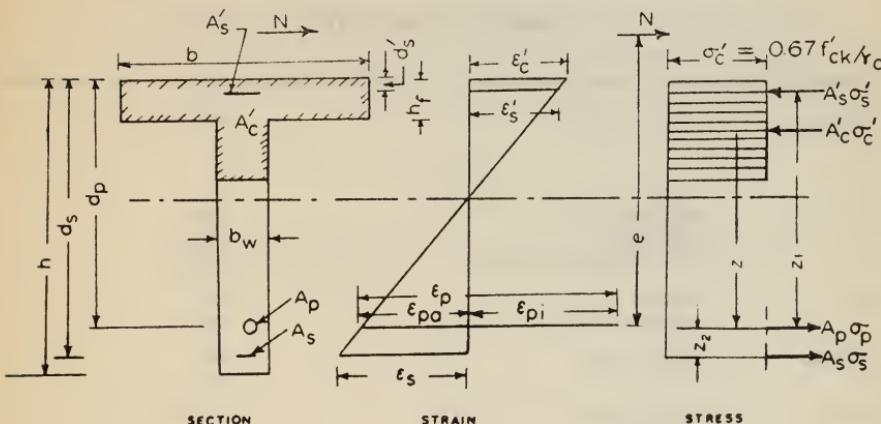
Typical Notations for a Concrete Beam: Analysis of Section
